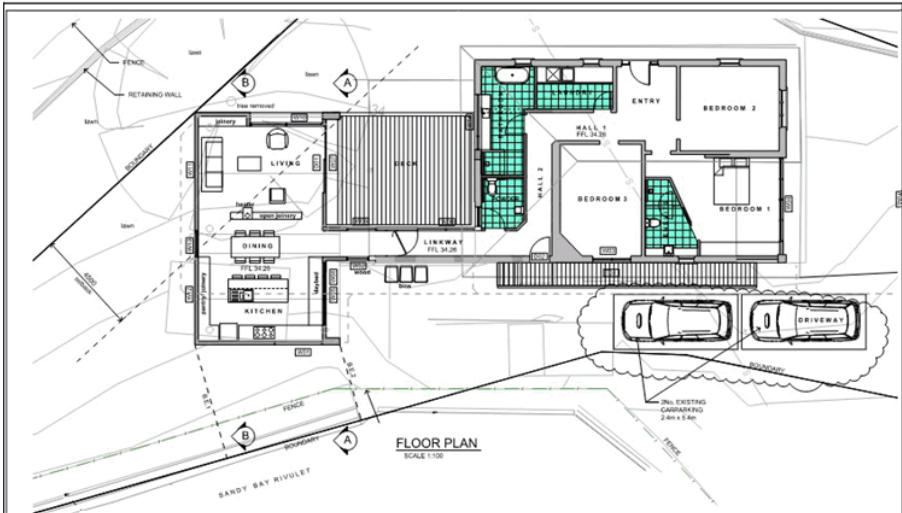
Proposed Floor Plan (Eade Designs, 2020)
